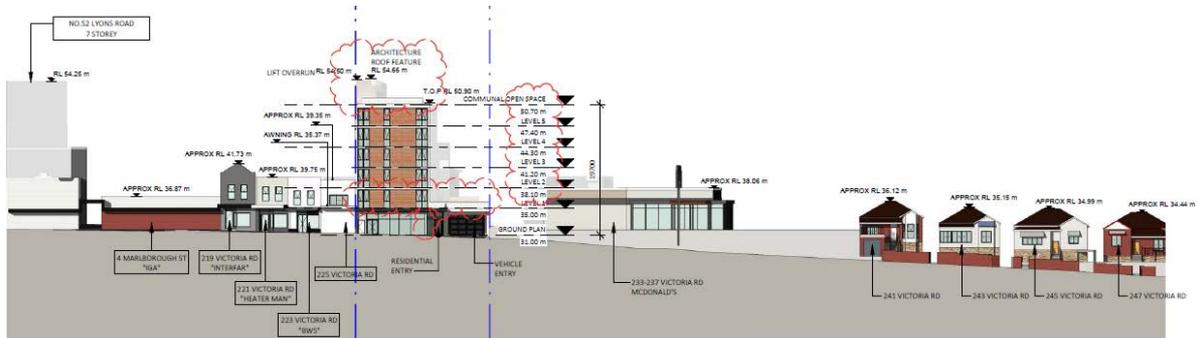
Victoria Road South Western Side Elevation (DA-0-305 Rev D)
